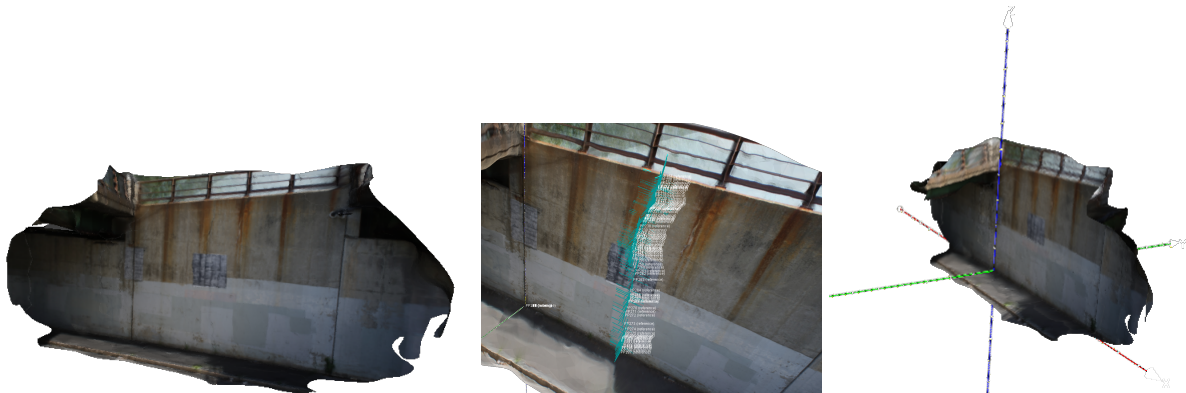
Large Crack on abutment Lincoln St. Lowell MA.
